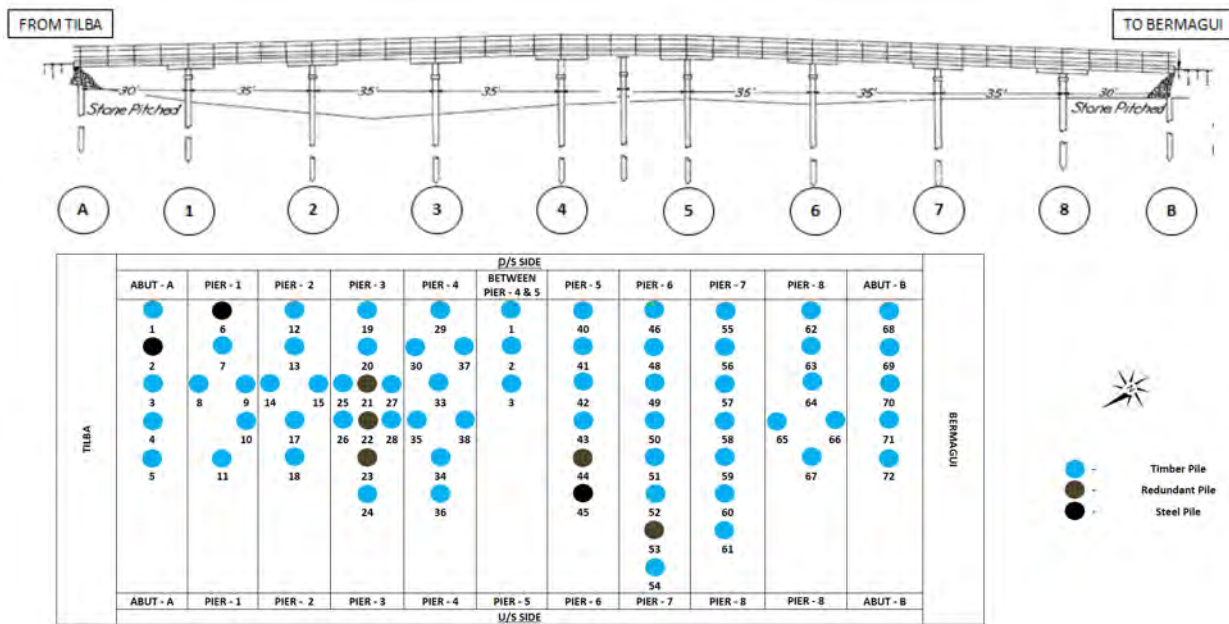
Wallaga Lake bridge pile layout (provided by TfNSW).
